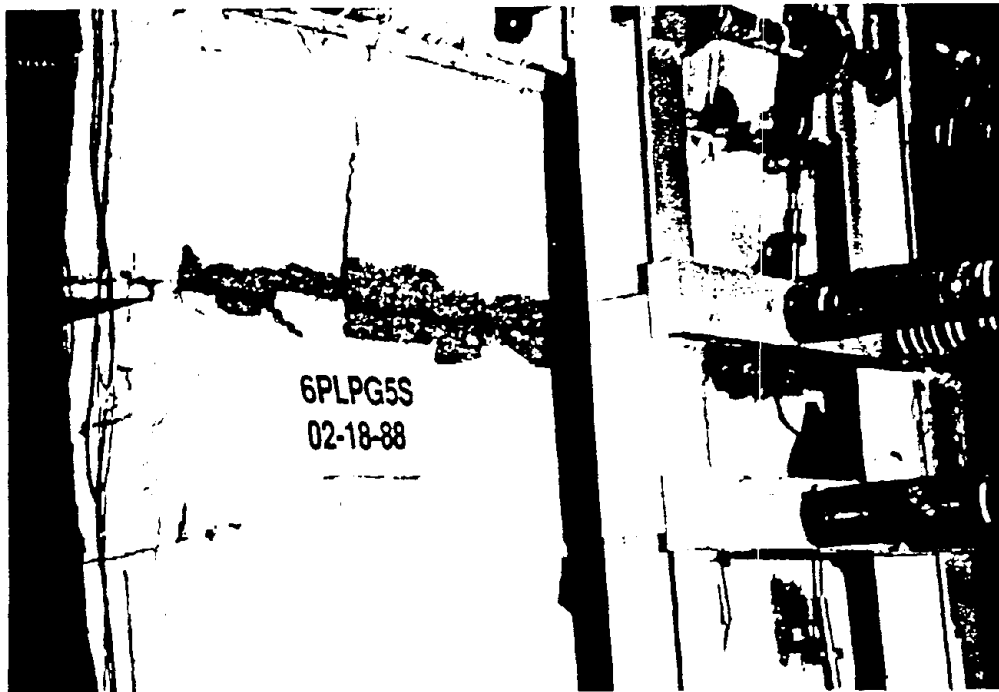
Bond Failure at Location of Vertical Rebars
